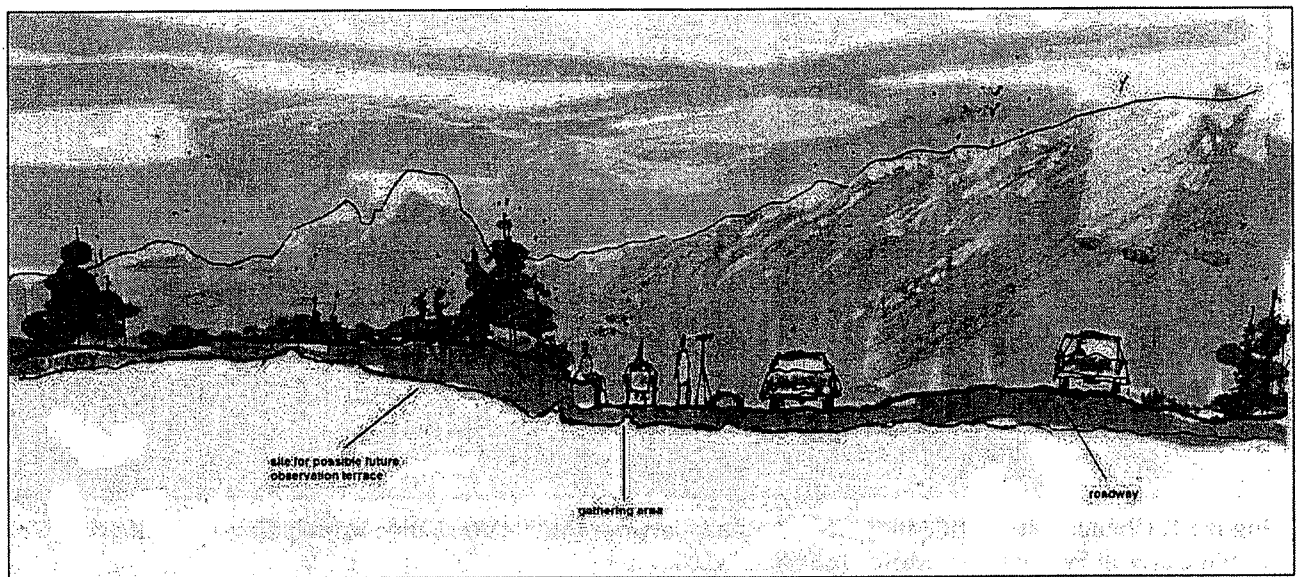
Conceptual illustration of a gathering/viewing area at Site 14 overlooking Swiftcurrent Lake, west of the Many Glacier Hotel T intersection.
